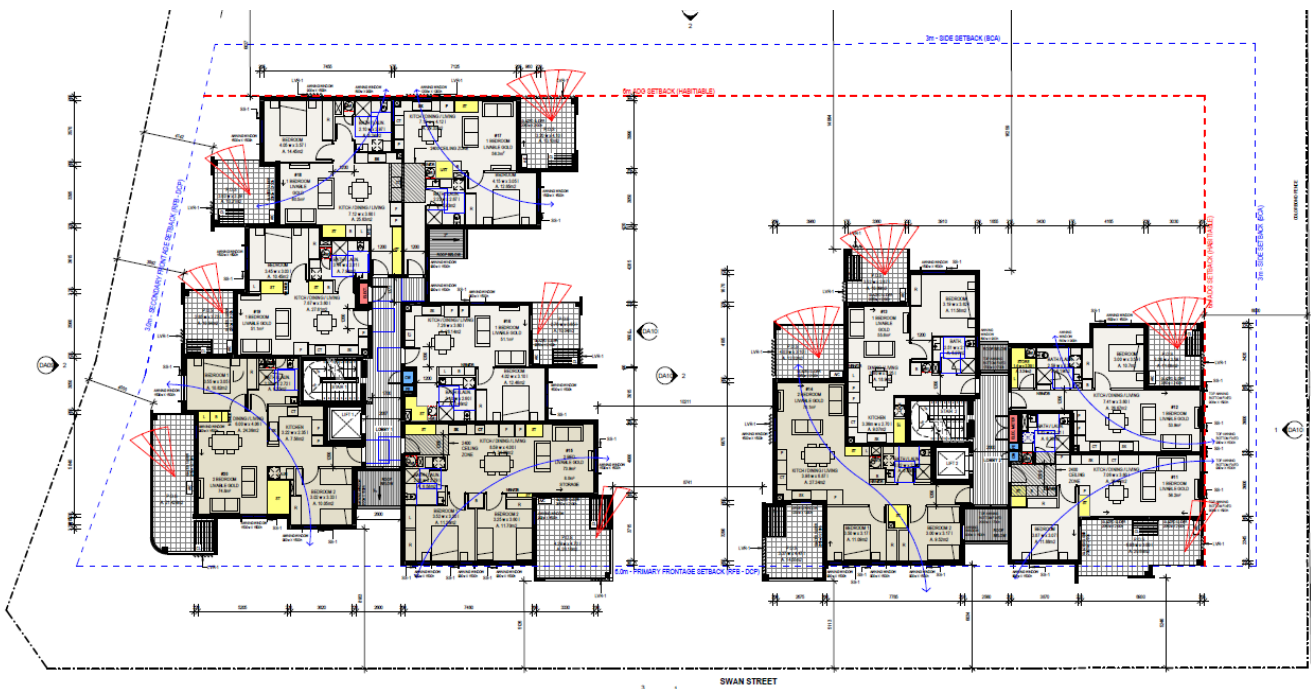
Extract from Architectural Plans – First Floor Plan Level 2 (Source: Architectural Plans, Brewster Murray Pty Ltd, dated 7/02/2025)
